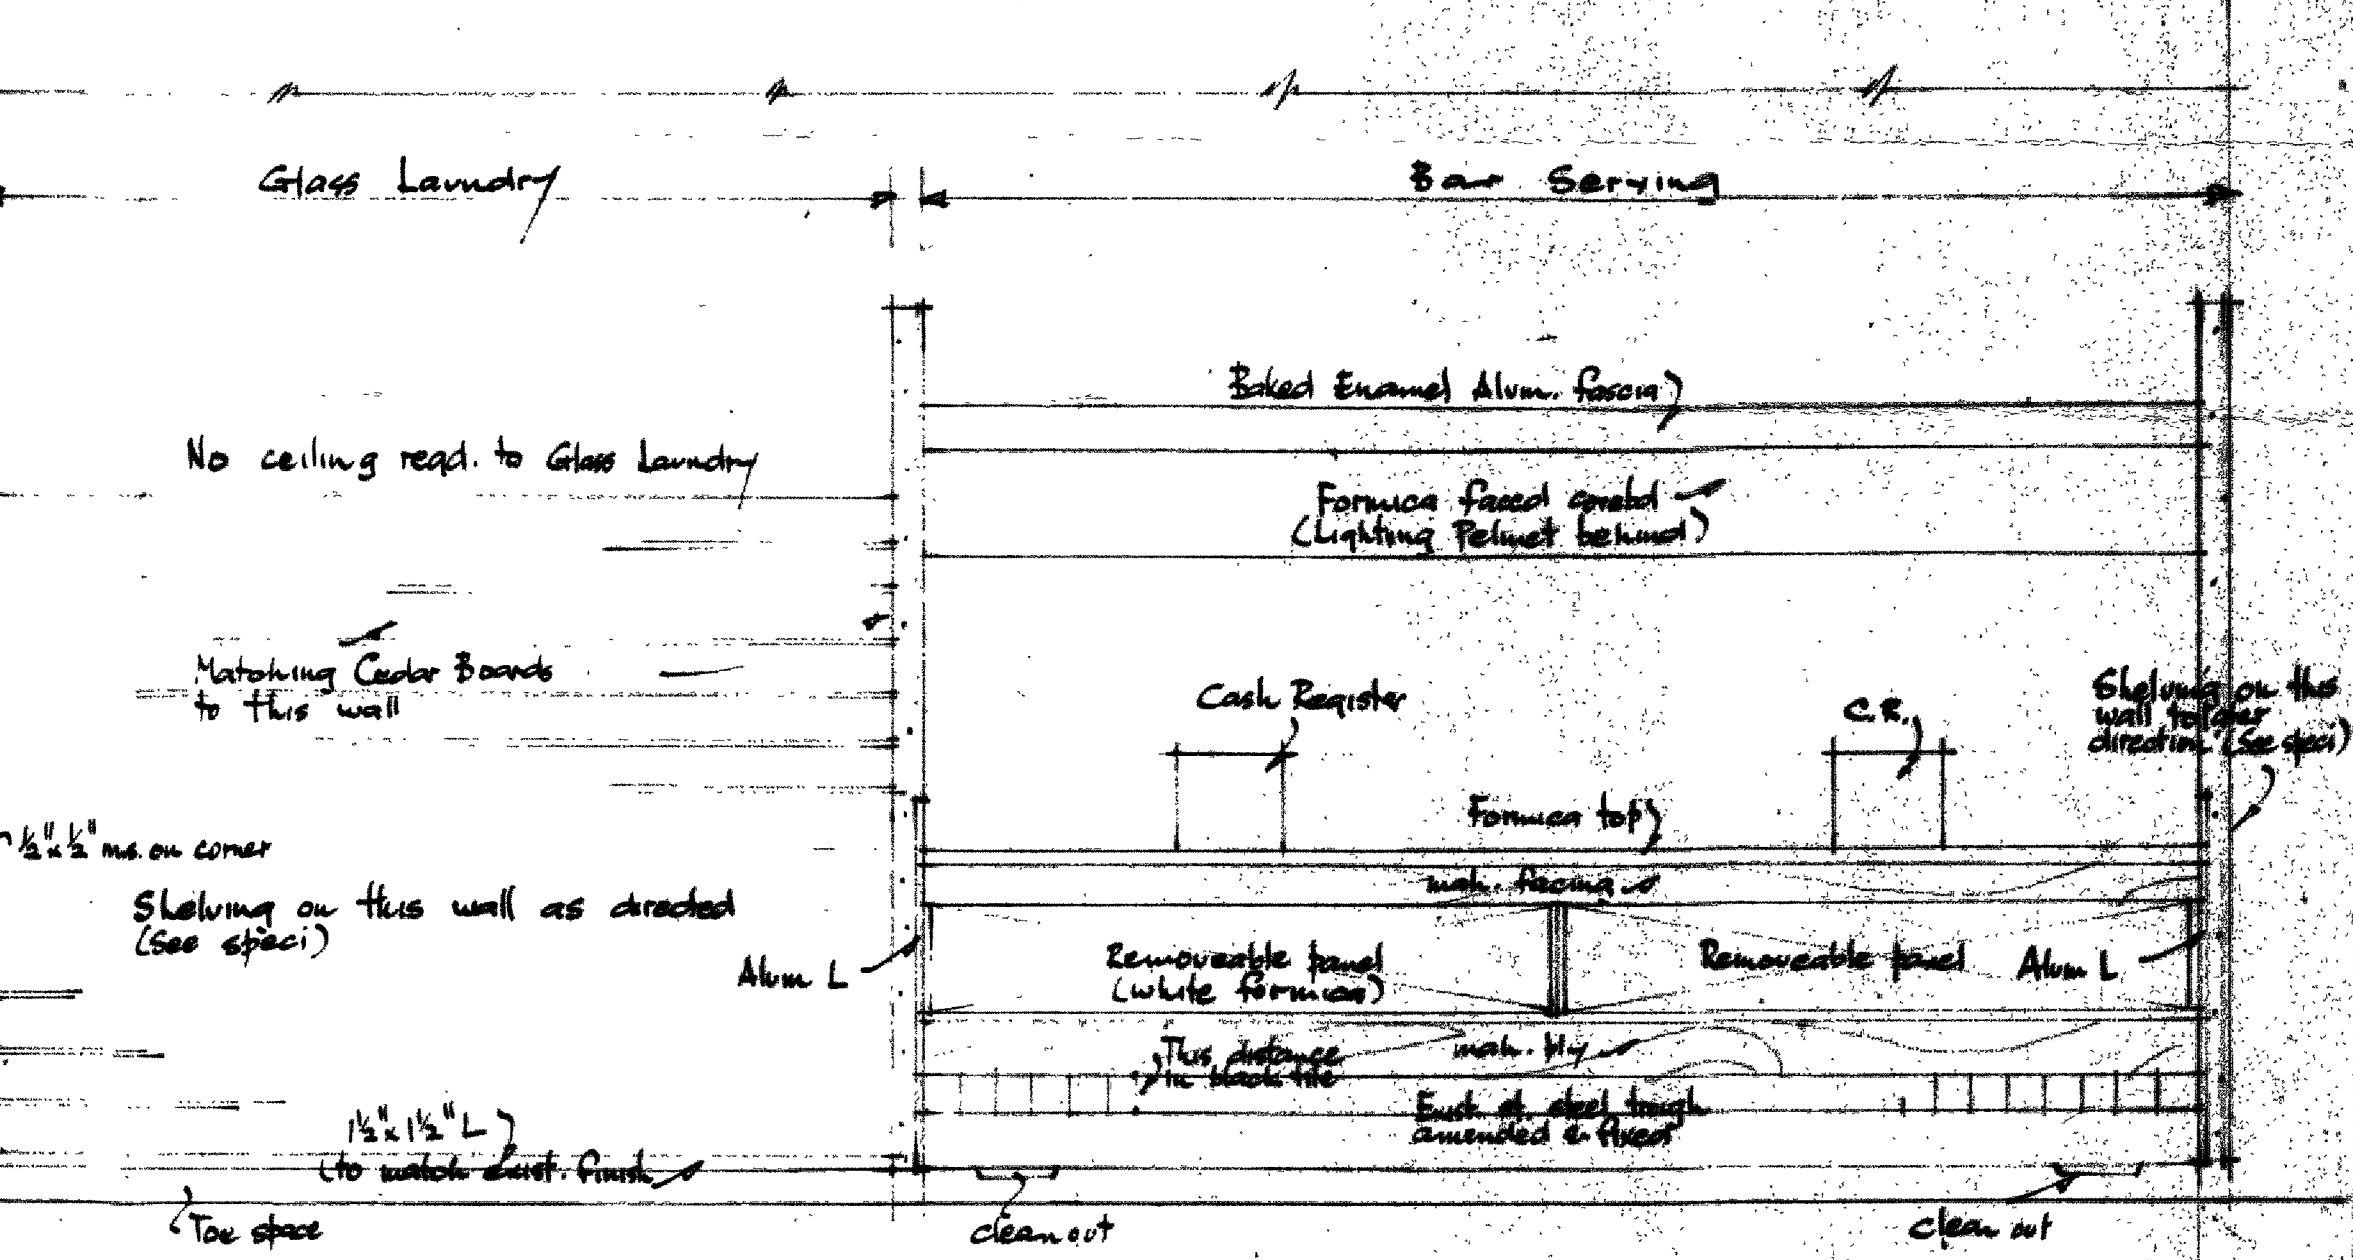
DETAIL PLAN OF NEW BAR COUNTER & SERVING AREA AND GLASS LAUNDRY
